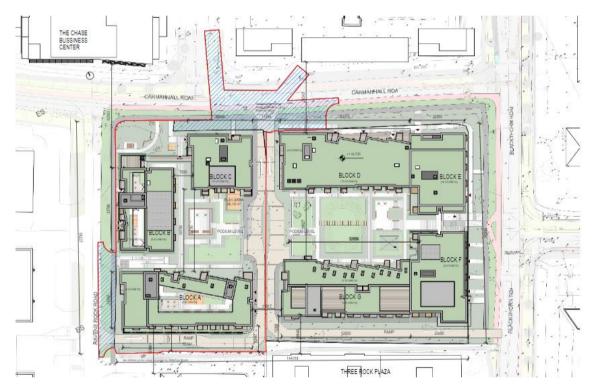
Proposed site plan with red line boundary showing overall masterplan with adjoining 'Avid' Site. Source: McCauley Day O'Connell Architects
